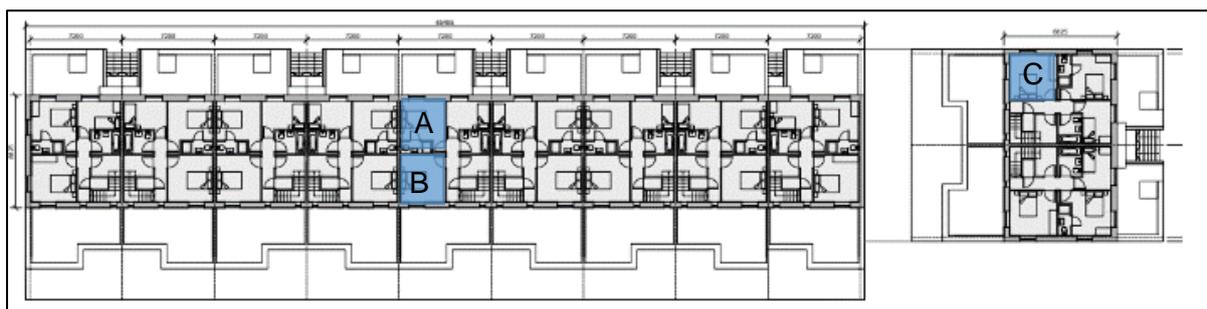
Block D&E – Second Floor Assessed Rooms Highlighted in Blue
